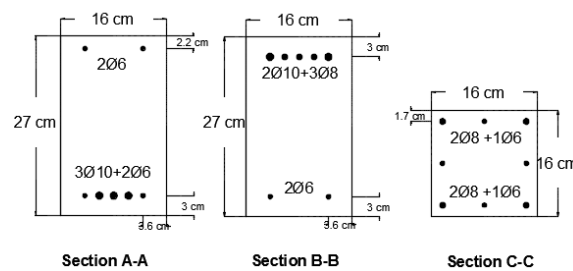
Cross-sections of columns and beams in reduced scale rc frames
